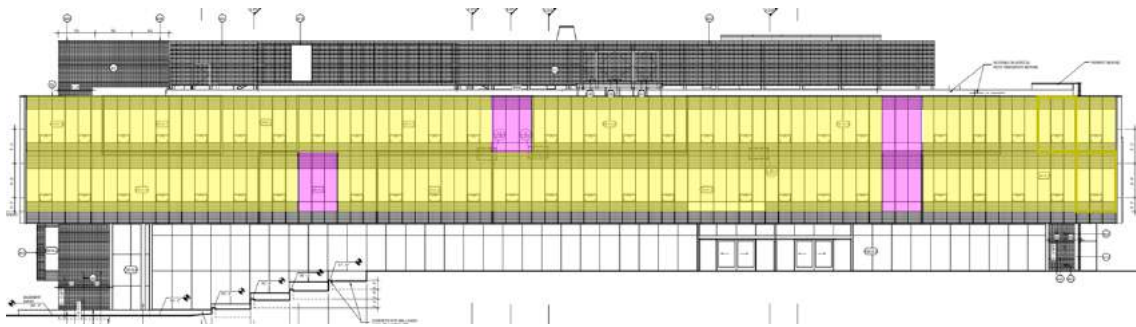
CoorsTek Center - North elevation (Source: Architectural plans)
